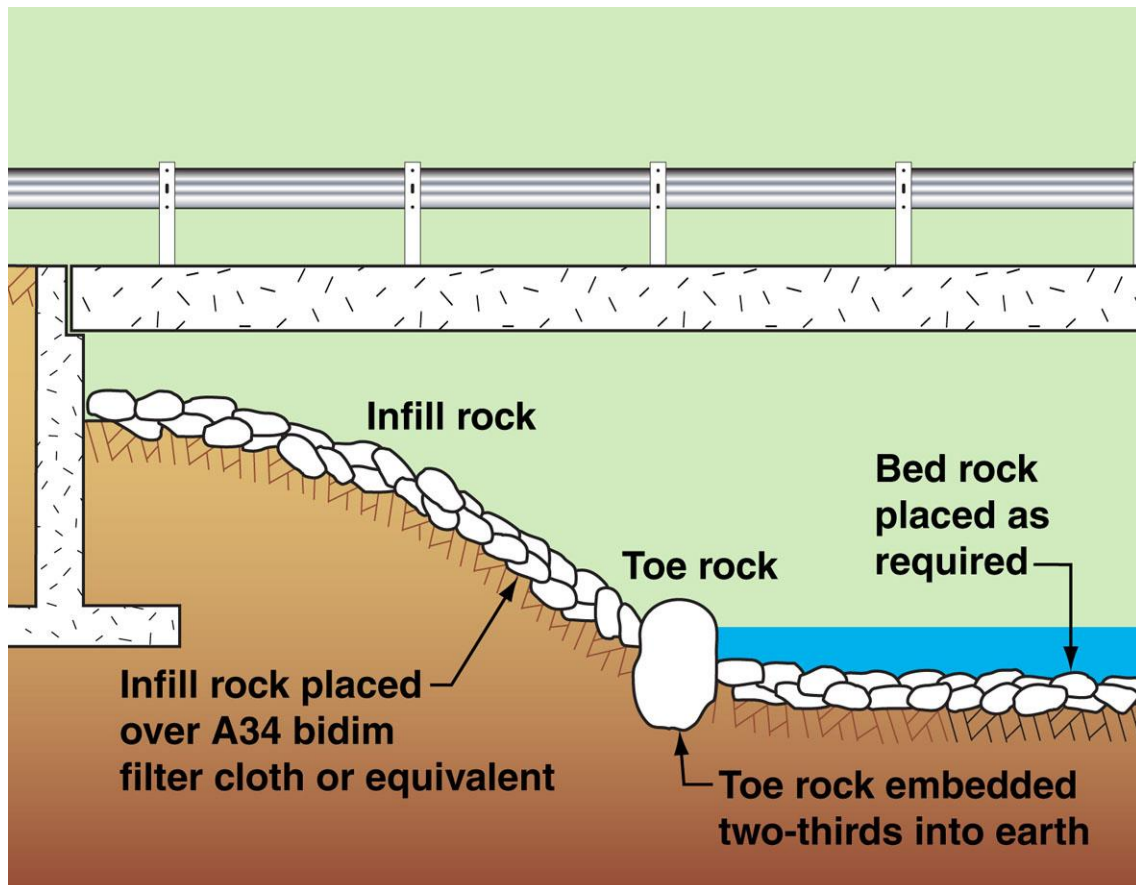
Typical placement of rock under 'minor' bridge crossings
